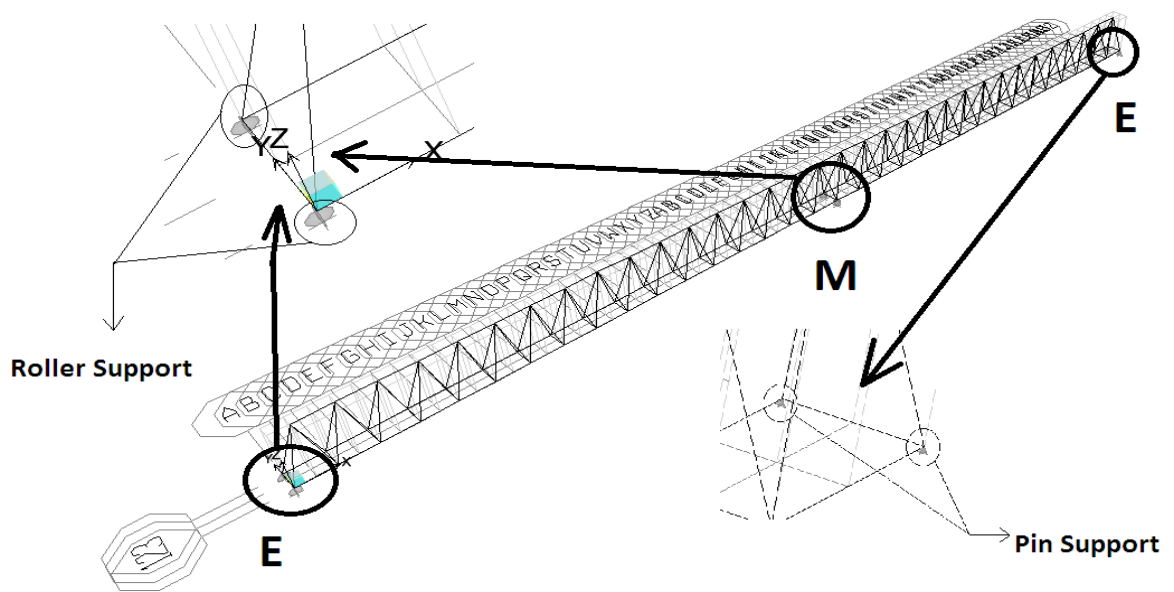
Precast joist supported at the ends by the Girder and with one temporary intermediate support
